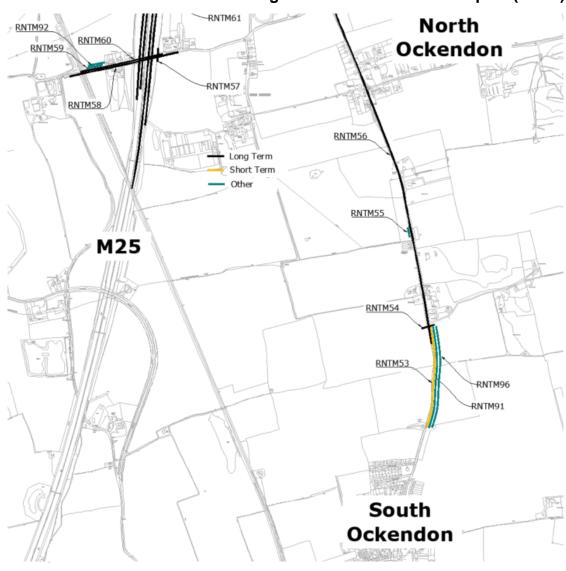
Roads North traffic management measures location plan (5 of 7)
